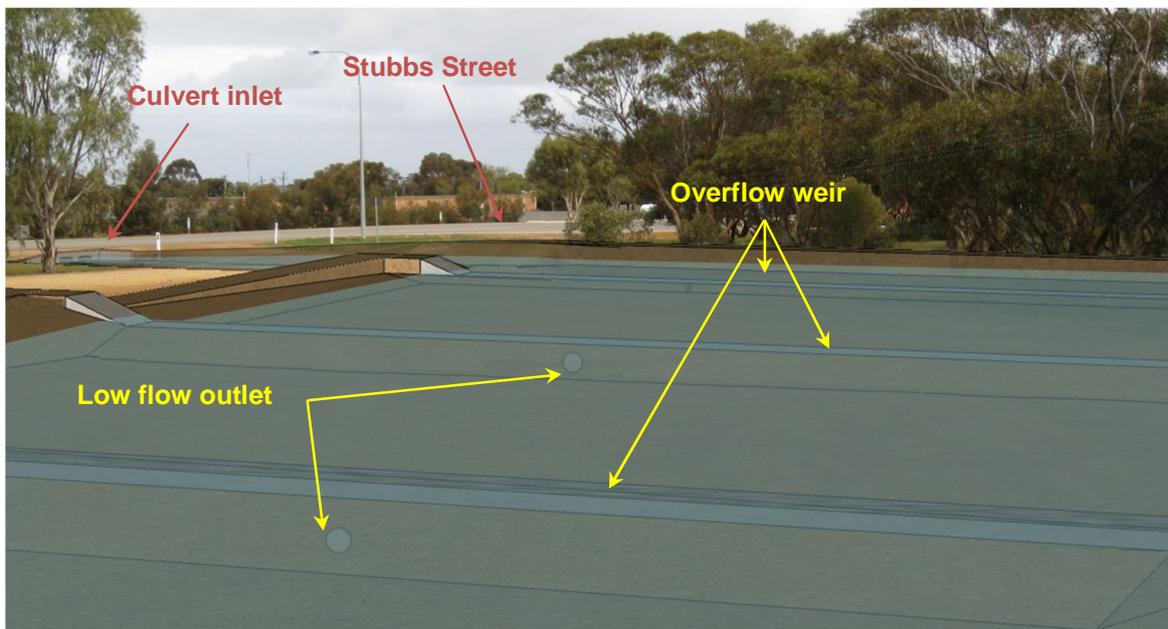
Stage 2: concept view of cascading basins (looking towards Stubbs Street)
